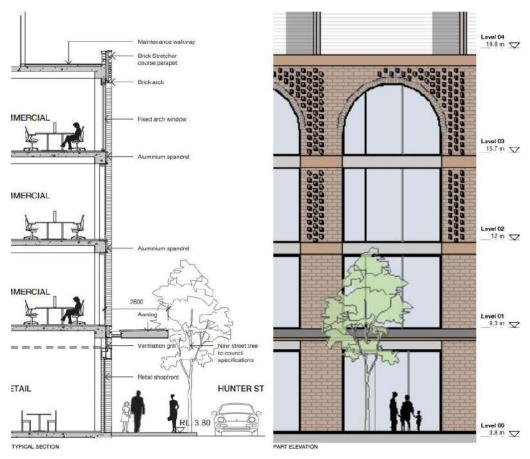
Detail elevation and Section of the Podium facade. Face brickwork, arched openings and brick detailing such as stretchers, headers, soldiers and voussoirs reference the numerous quintessential brick buildings in the Heritage Conservation Area but are expressed in a more contemporary way without mimicking the past. Doma Group/ Bates Smart
